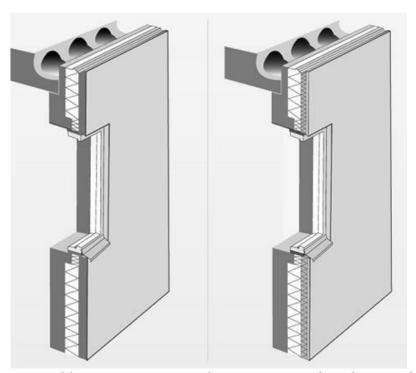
Two construction alternatives regarding the assembly of the exterior wall. Partly prefabricated 1, sandwich wall element and partly prefabricated 2, single-element concrete wall (Strängbetong, 2014).
